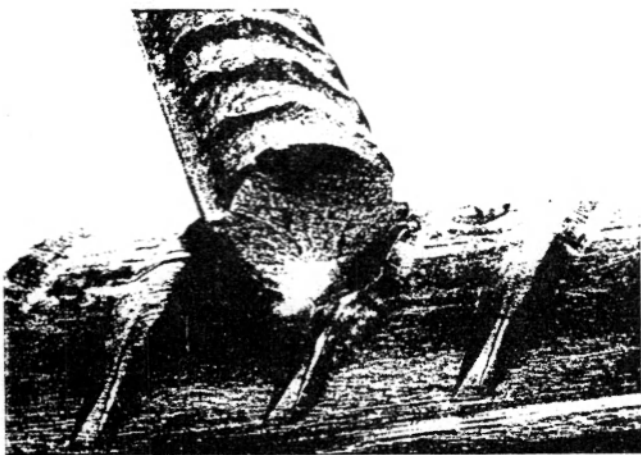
Tensile test. Brittle fracture in the weld
